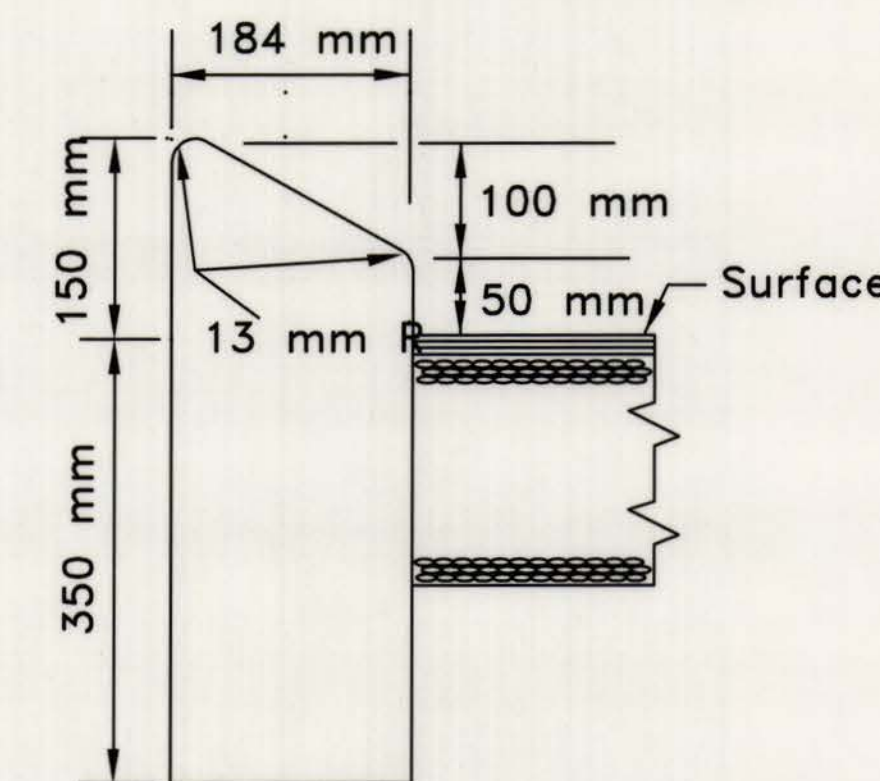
DETAILS SHOWING PLACING OF CONCRETE CURB BY SEPARATE METHODS
